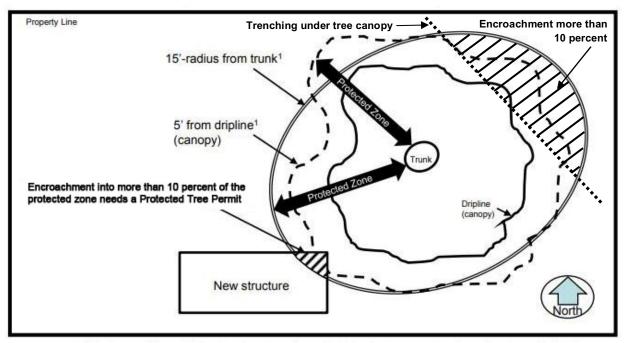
Any development (including but not limited to structures, walls, fences, grading, paving, irrigation, landscaping, decks, storage, and parking) must be located outside the tree protected zones of all SEA Protected Trees. When determining whether there is an encroachment, consider the protected zones of both protected trees on the subject property and those outside the property, including within the public right of way.
